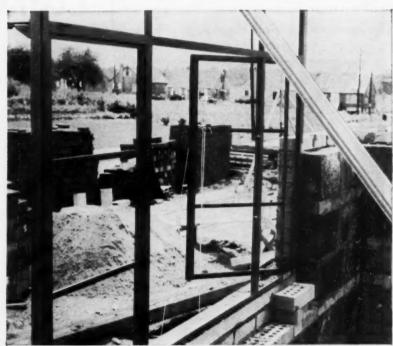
PHOTO SHOWS how simple it is to hold steel windows plumb with a supporting board until brickwork reaches high enough to support frame.
